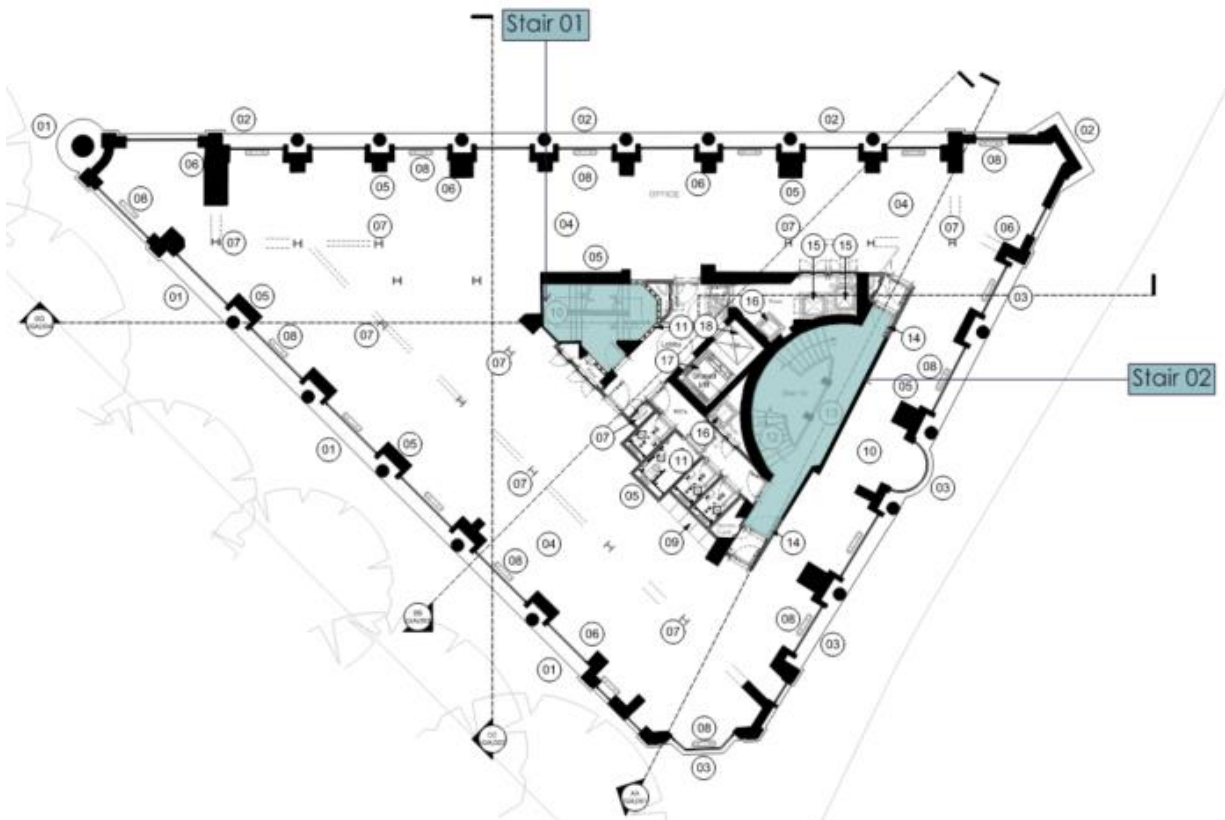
Proposed 5<sup>th</sup> floor layout.
